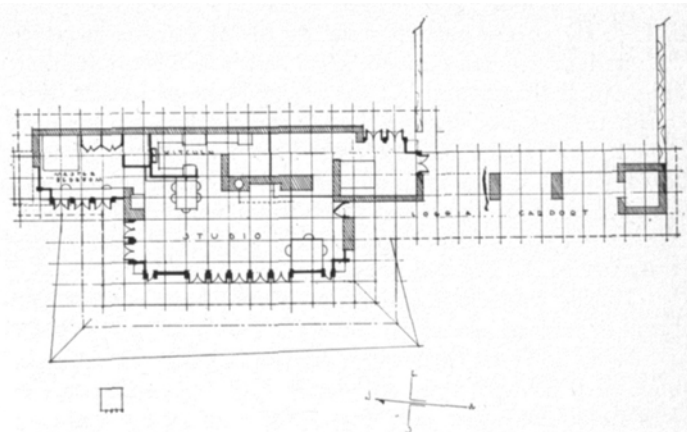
Donald Lovness house, Stillwater, Minnesota, 1957. Floor plan, (redrawn by the author).
